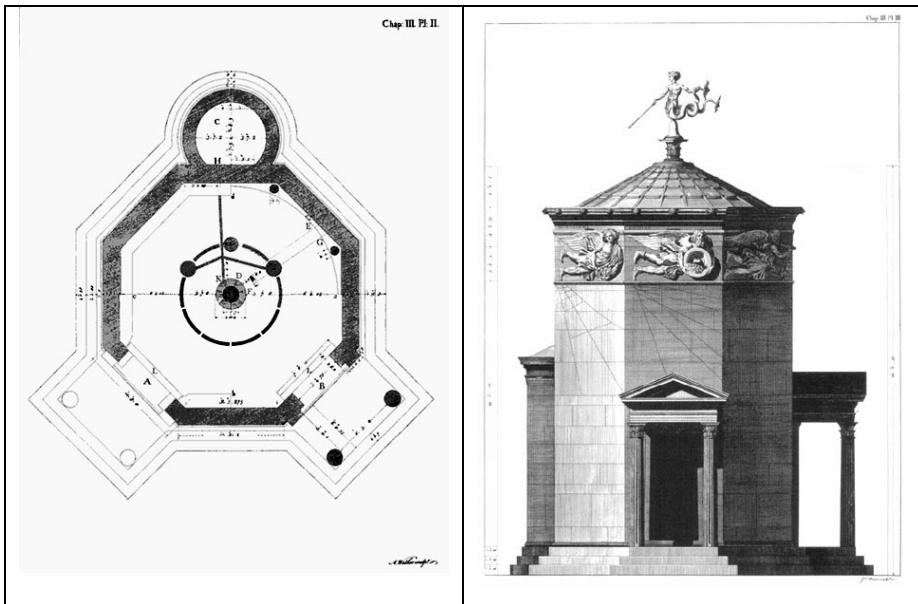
(left). Tower of the Winds, plan [Stuart and Revett 1787: Ch. III, Pl. II]
